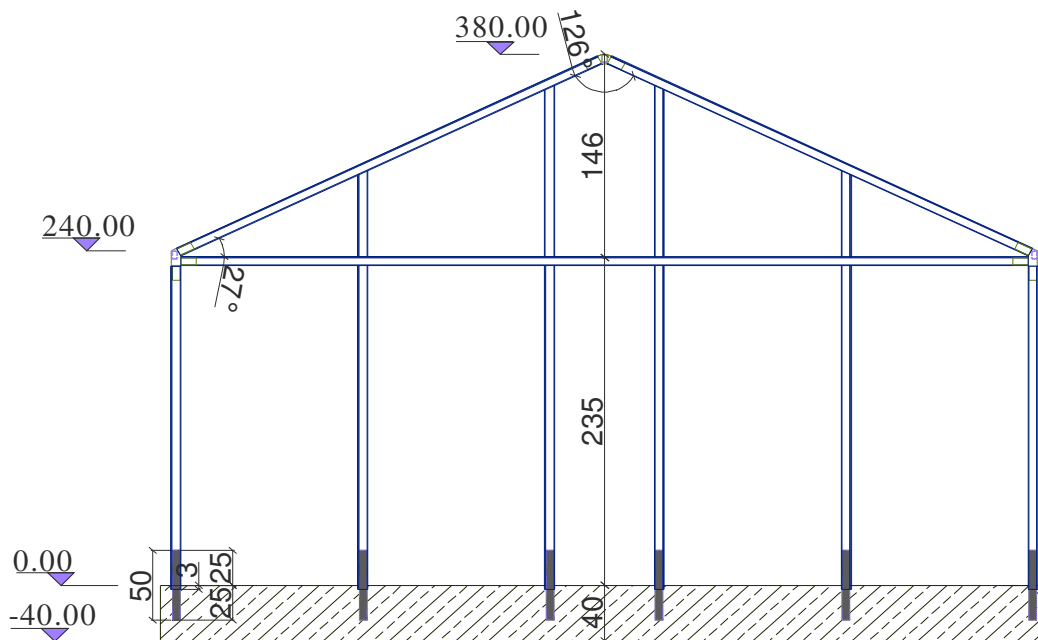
GFRP greenhouse application model A-A section (dimensions are cm).
